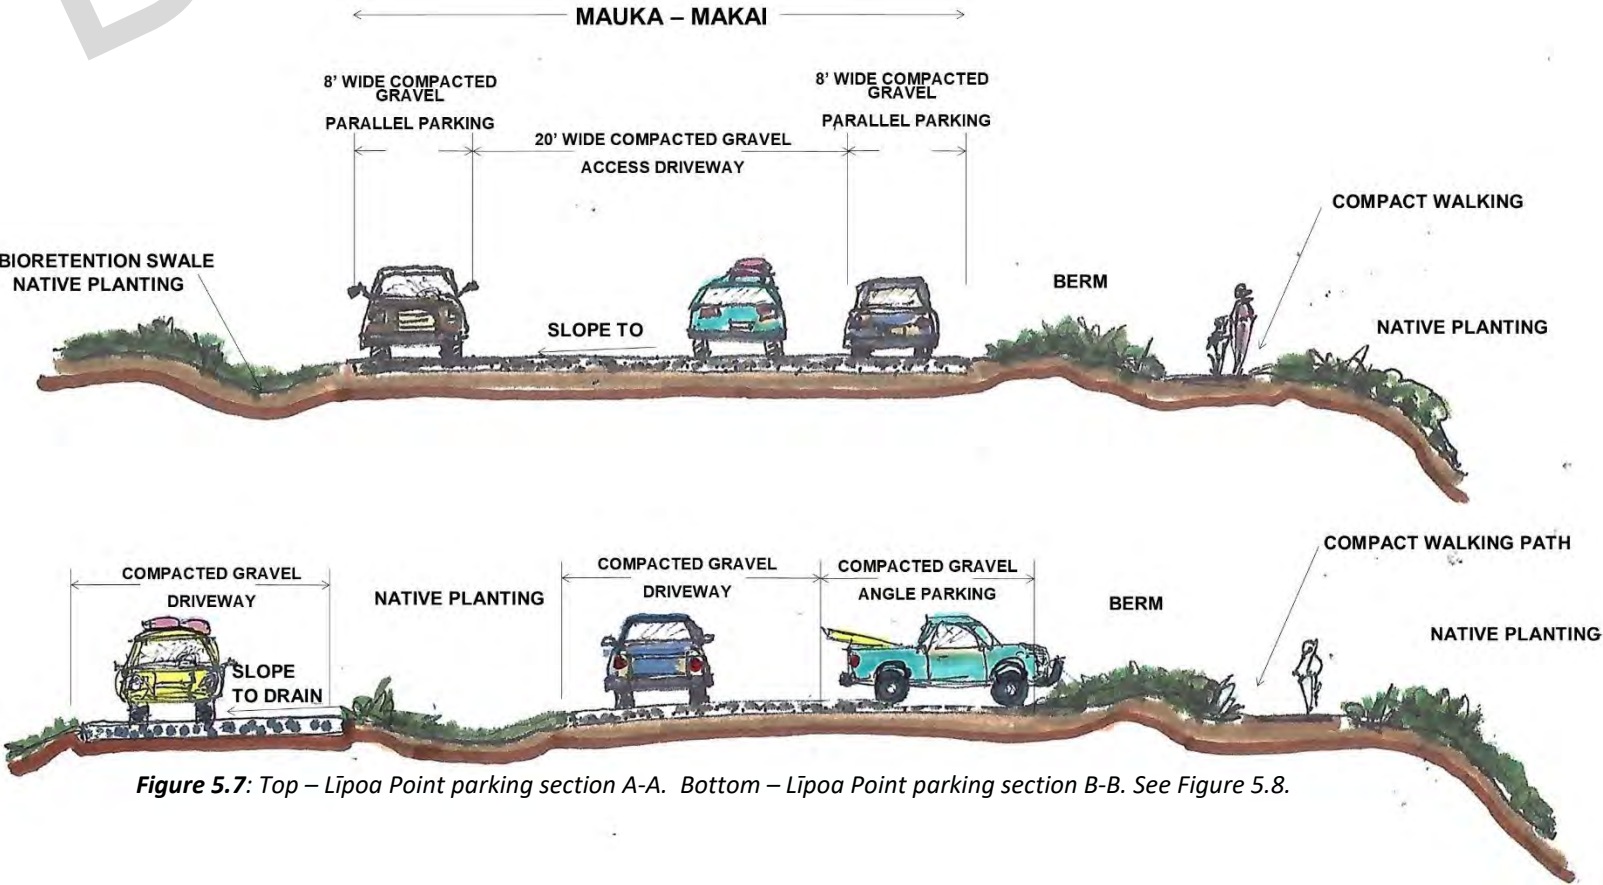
Top – Lipoa Point parking section A-A. Bottom – Lipoa Point parking section B-B. See Figure 5.8.
